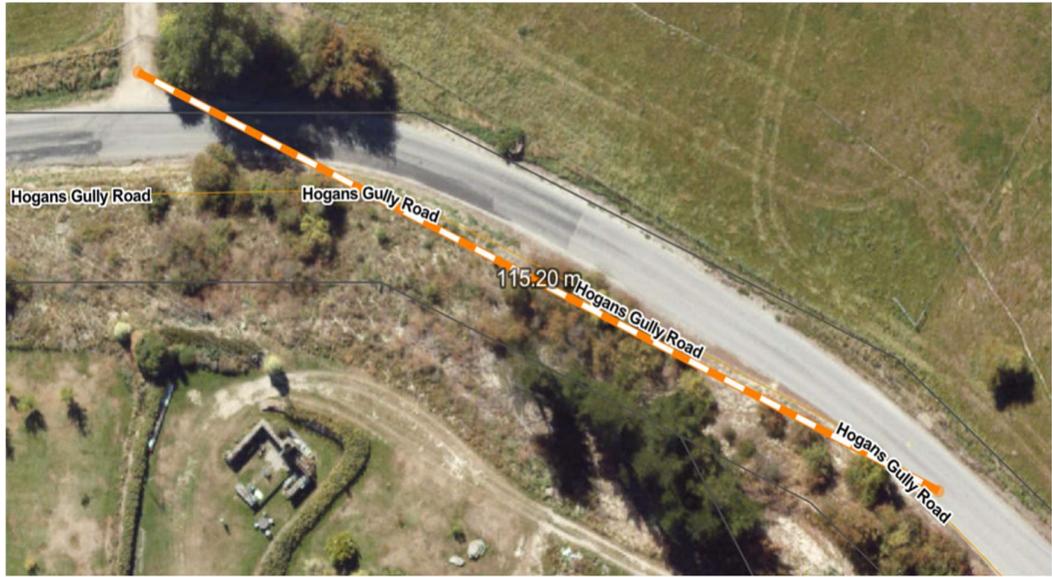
Aerial photo of battering work required at Hogans Gully Road to create a 115 metre sight distance
